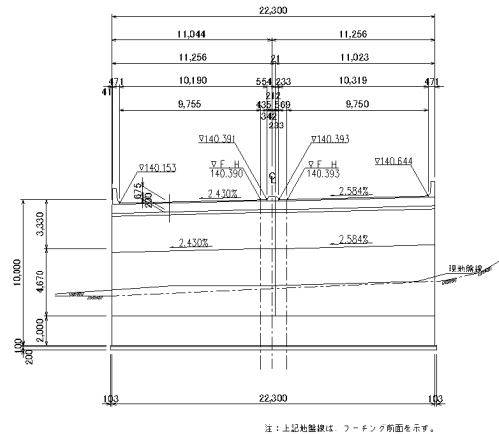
Elevation view of the bridge deck and approach road. The diagram shows a cross-section of the bridge deck with a central vertical axis. The deck width is 21.550m at the top. The deck surface is sloped at 4.0% on both sides. The approach road is shown below the deck, with a 2.0% slope. The bridge piers are shown at the bottom, with a width of 1.83m. The total length of the bridge is 10.000m. The approach road length is 4.64m. The total length of the bridge and approach road is 14.64m. The diagram also shows the bridge piers and the approach road structure.
